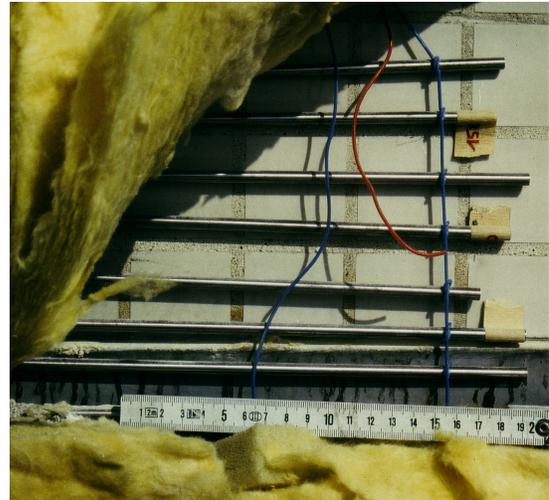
Unprotected steel bars after one year of in-situ storage between the fiberglass insulation and the outer layer of the concrete exterior wall.
